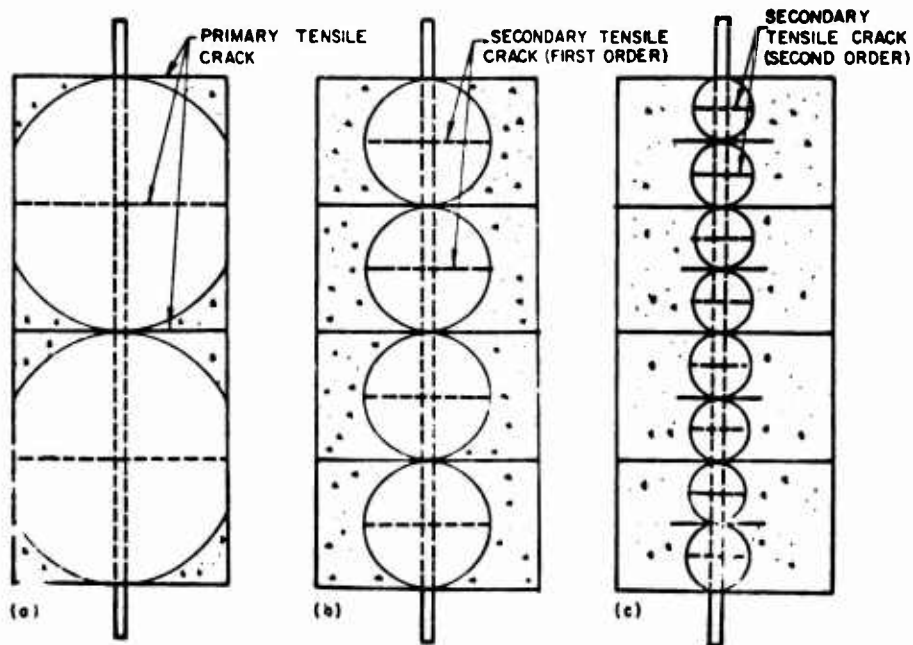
Mechanism of Tension Cracking (member reinforced with one bar) (Ref. 33)
